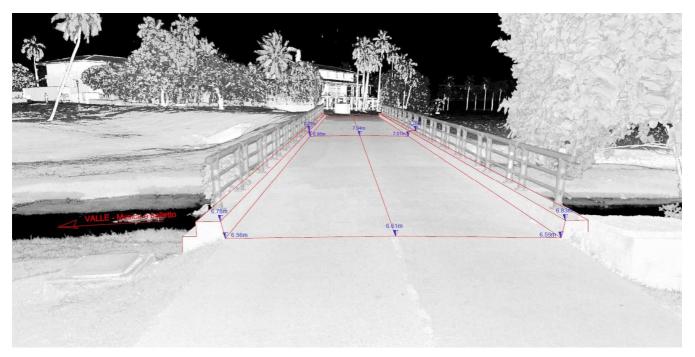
Absolute elevations of some elements of the bridge near the Rectorate building.
